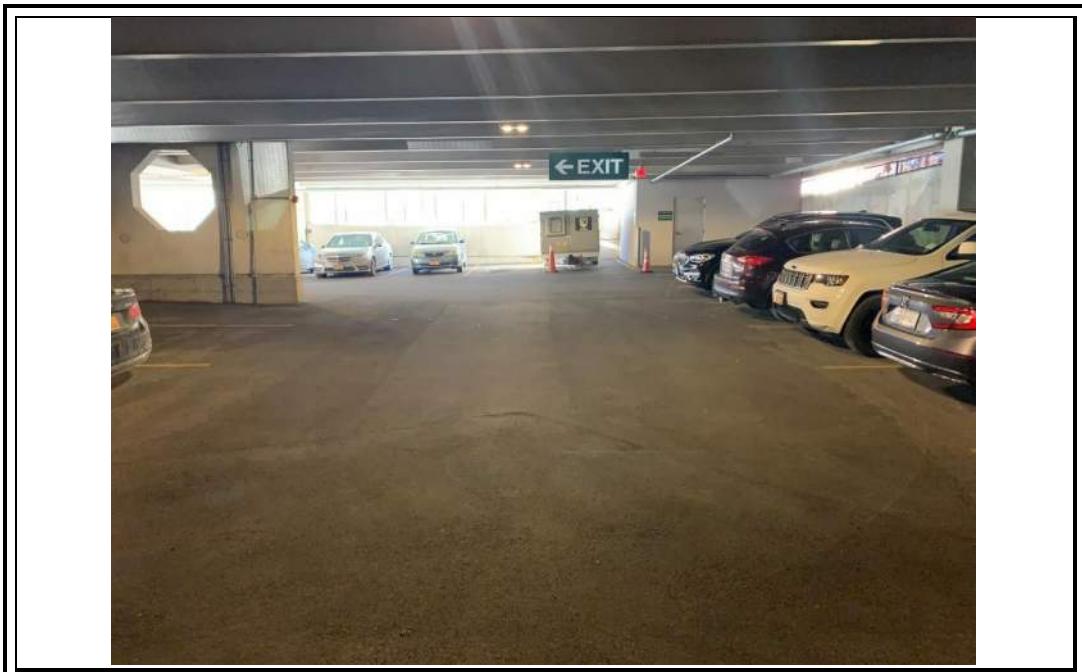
Looking southwest toward Howard Street; paved surface cover within lowest level of parking garage (12/14/22).
